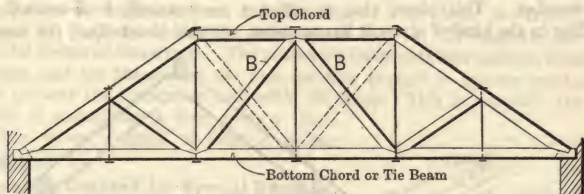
Queen-rod Truss. Spans from Forty to Fifty-two Feet
